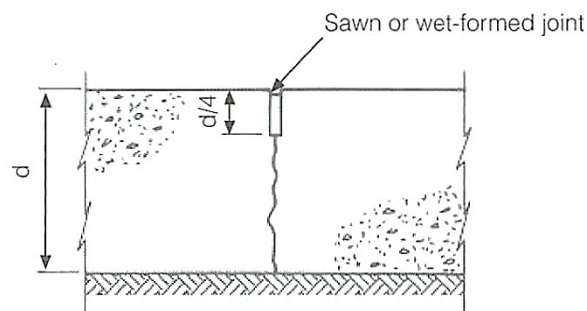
Section view of a typical transverse contraction joint (Source: Perrie, 2003)
